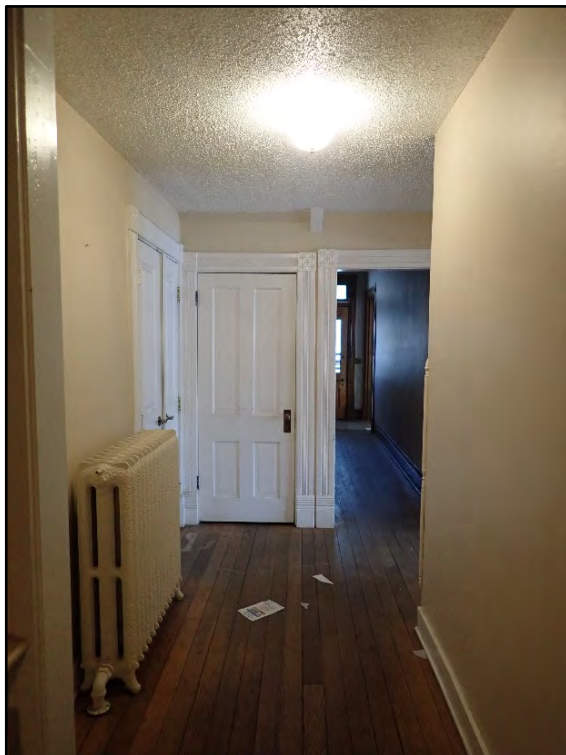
Looking back down the hall toward the front door and under-stair closet.
